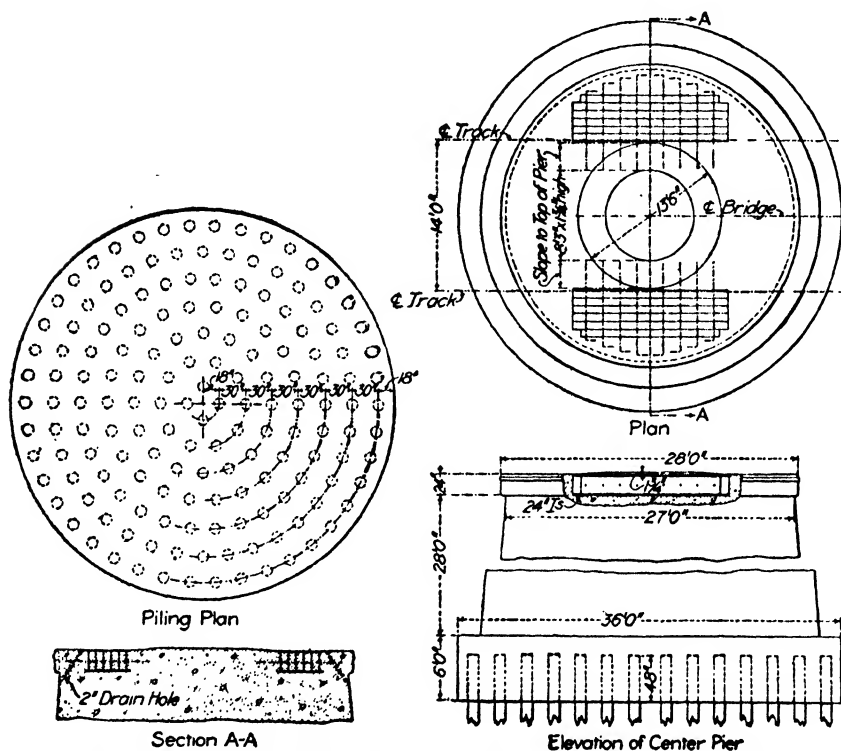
Concrete Pivot Pier, St. Louis River Bridge, Duluth, Minn.
